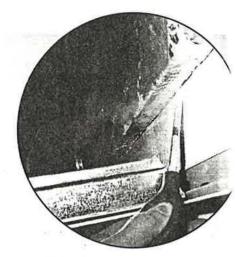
A masonry wall with part-filled cavity and drylining. Significant infiltration is occurring above the drop ceiling at the junction of the top of the plasterboard and the underside of the concrete ring beam.
